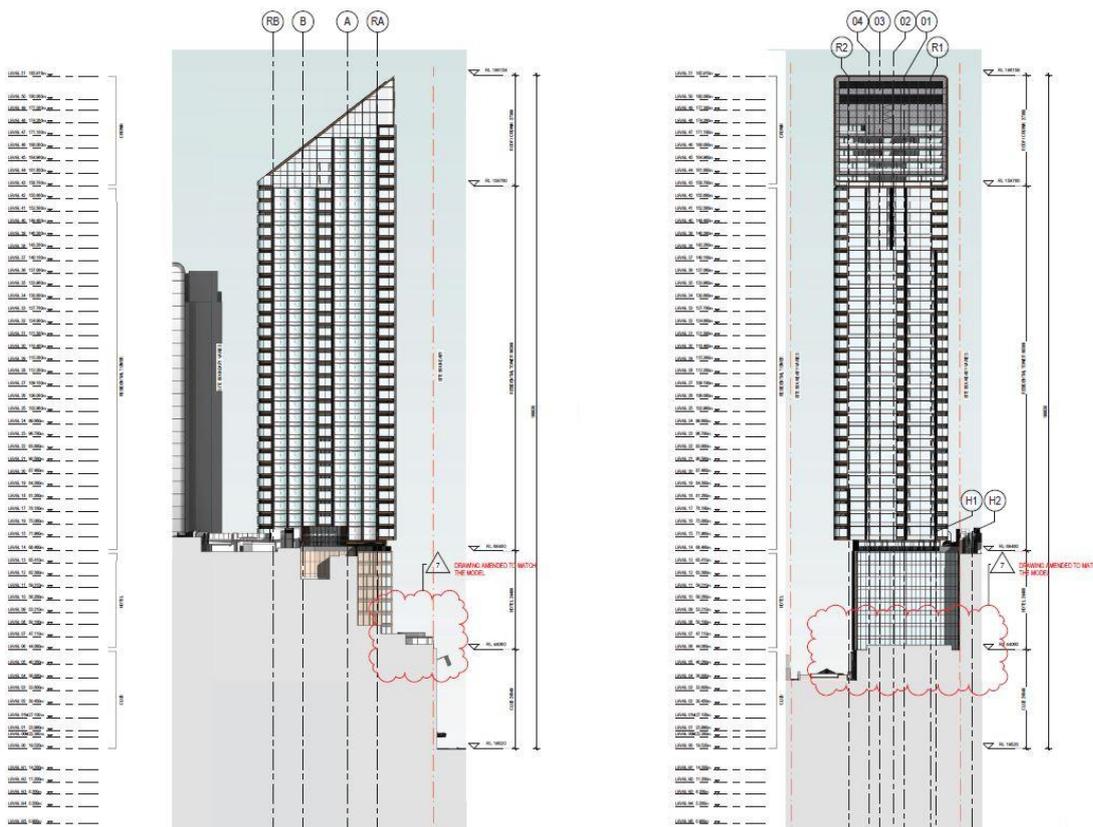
North (Market St) elevation left, and east (Castlereagh St) elevation right
